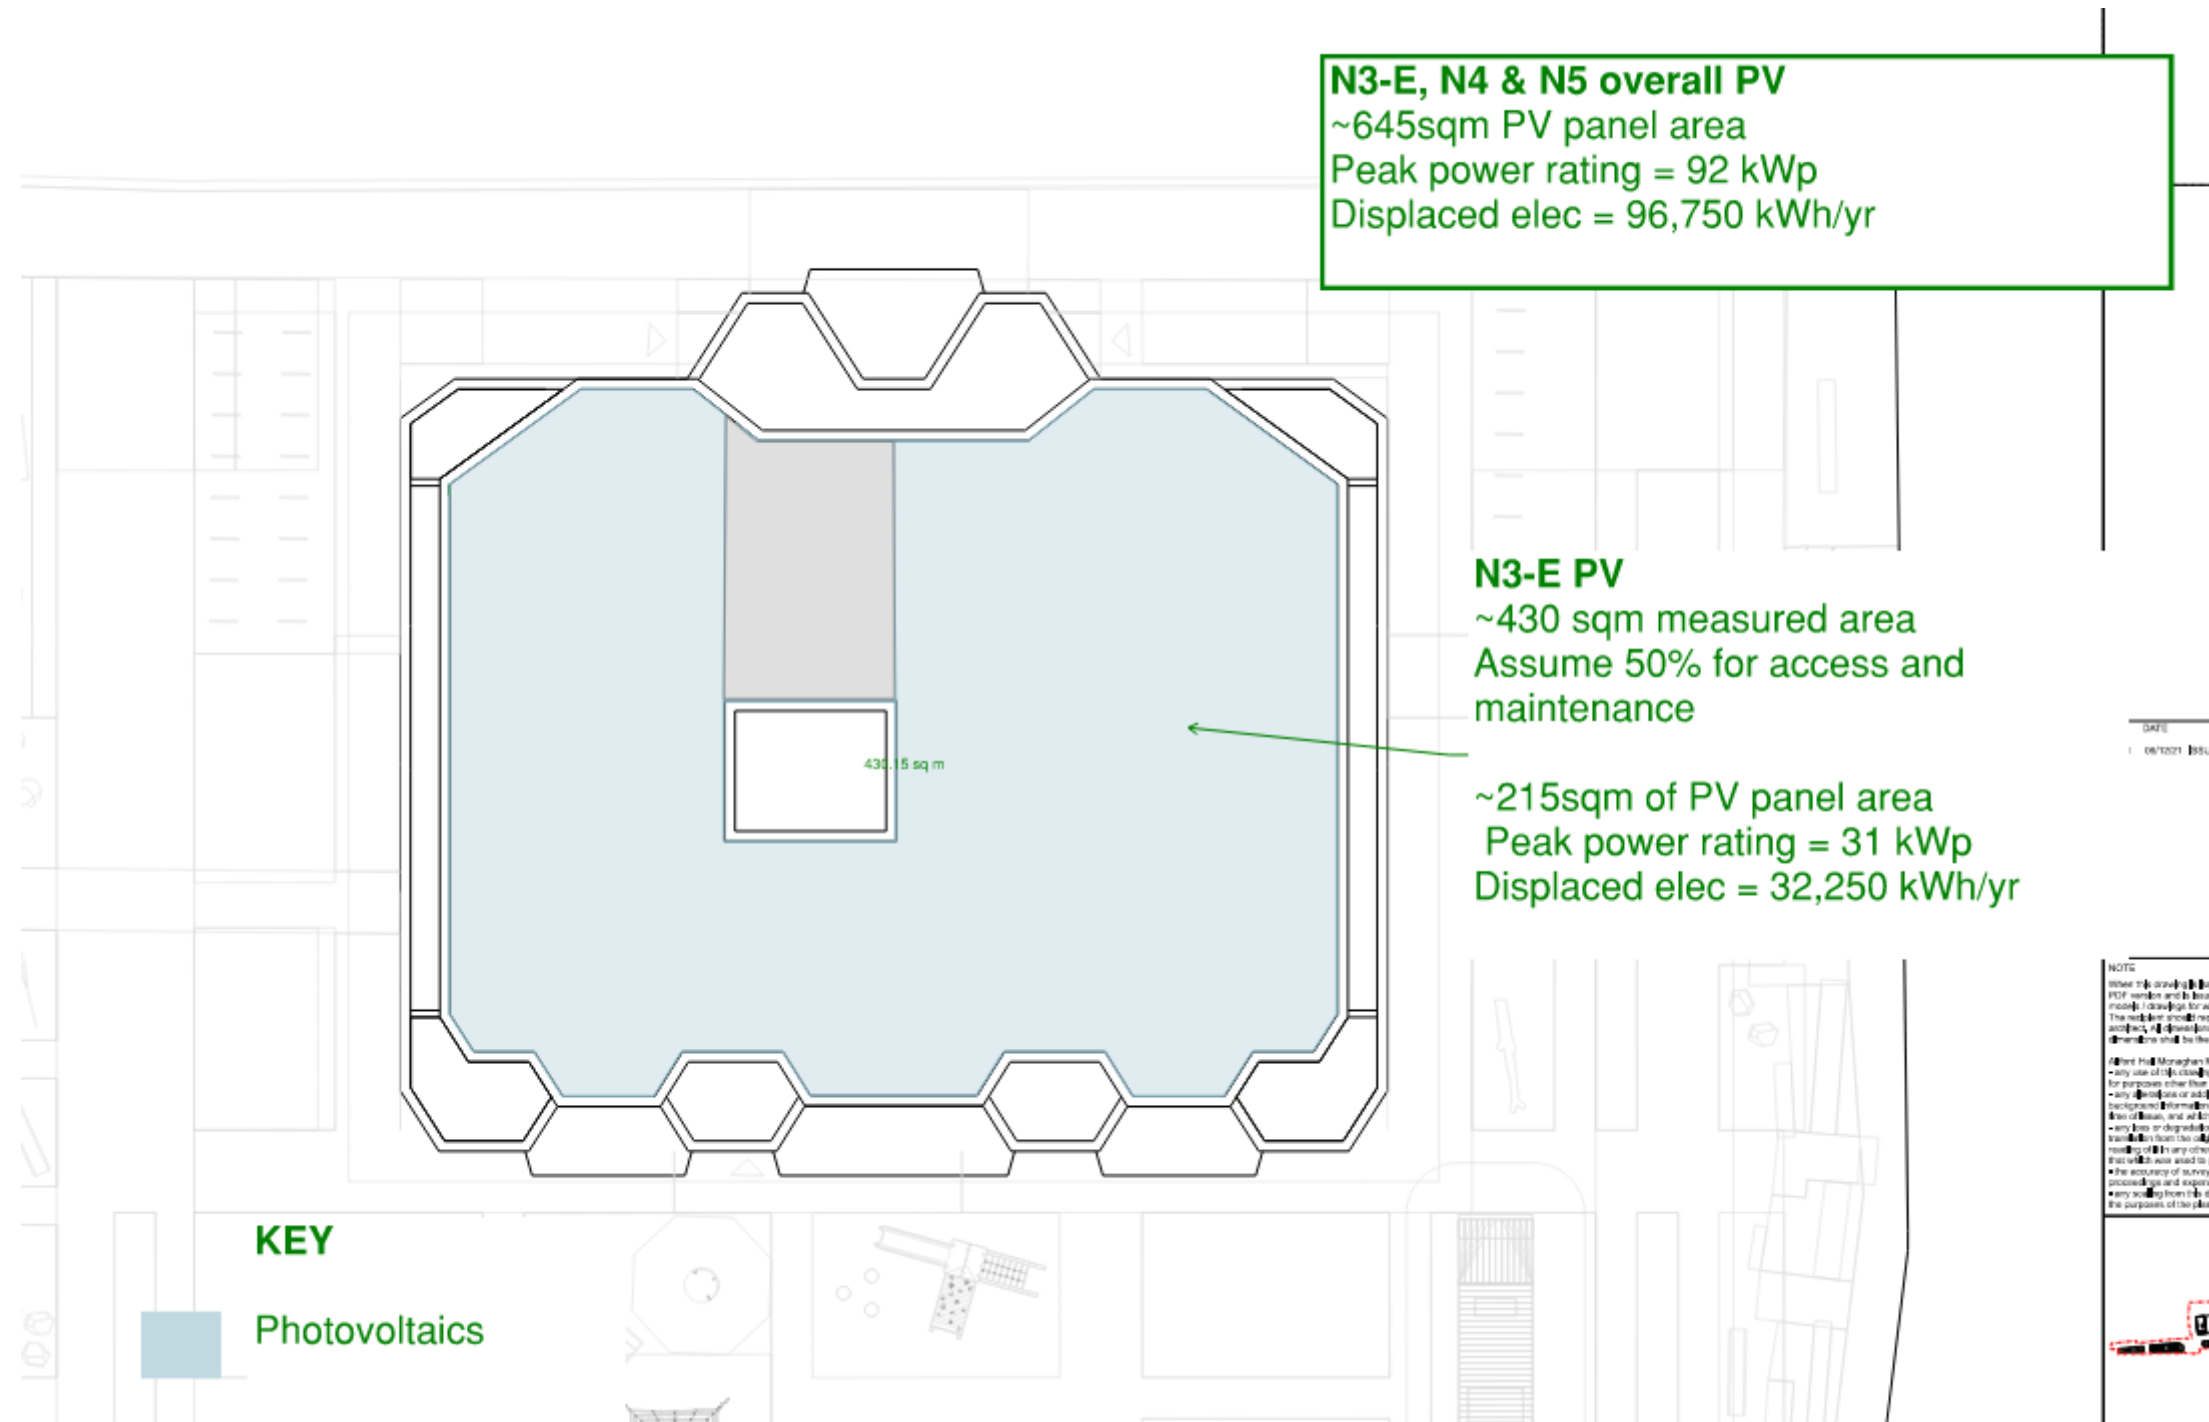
N3E - proposed area for solar photovoltaics on roof plan
